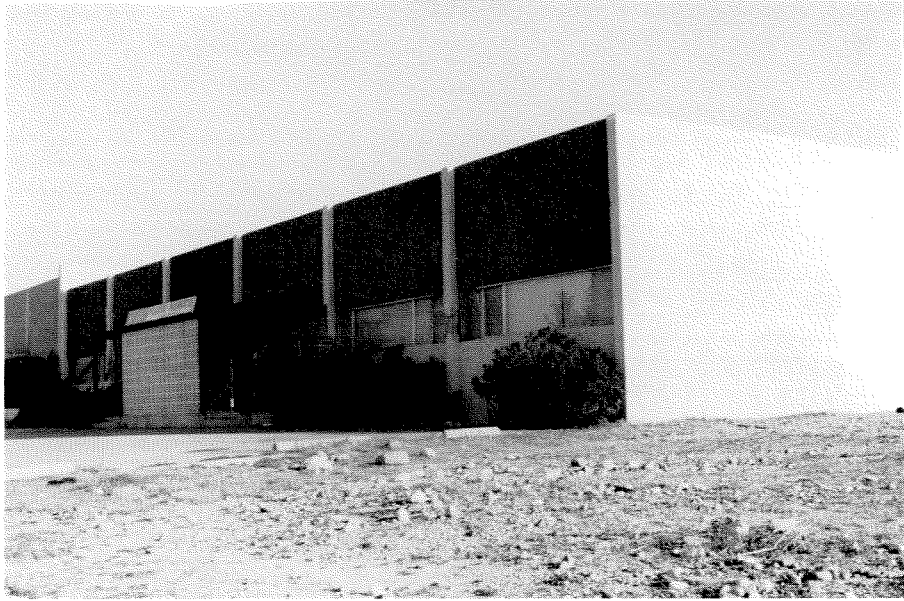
Front elevation (southwest wall) of the Gibraltar Building.
